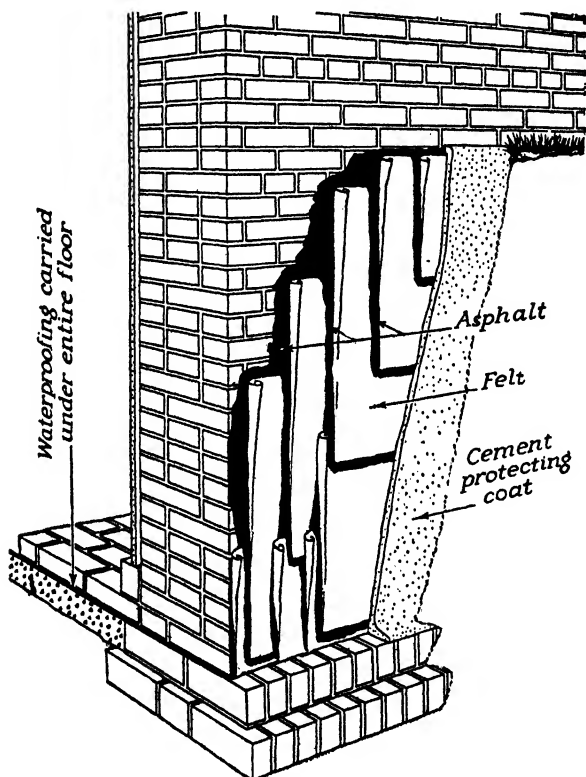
Method of applying membrane waterproofing to walls and floors subjected to severe hydrostatic pressure.
